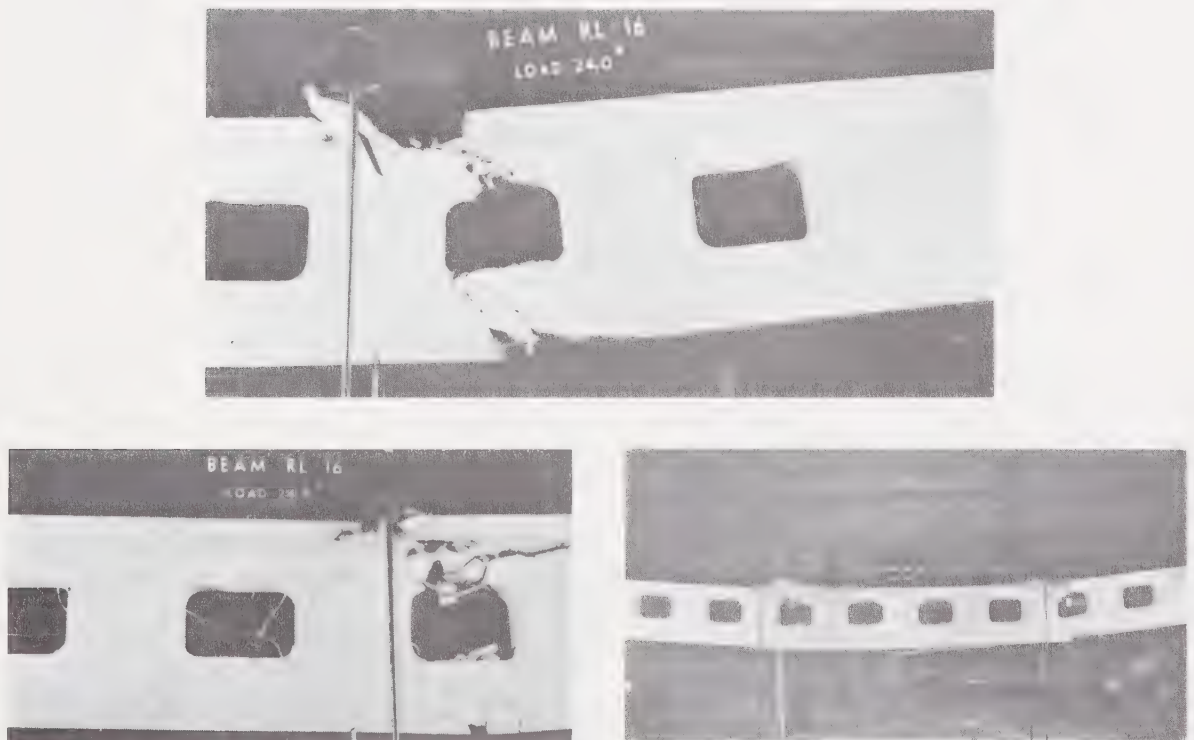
CRACKING AND FAILURE PATTERN OF BEAM 16-12-6
